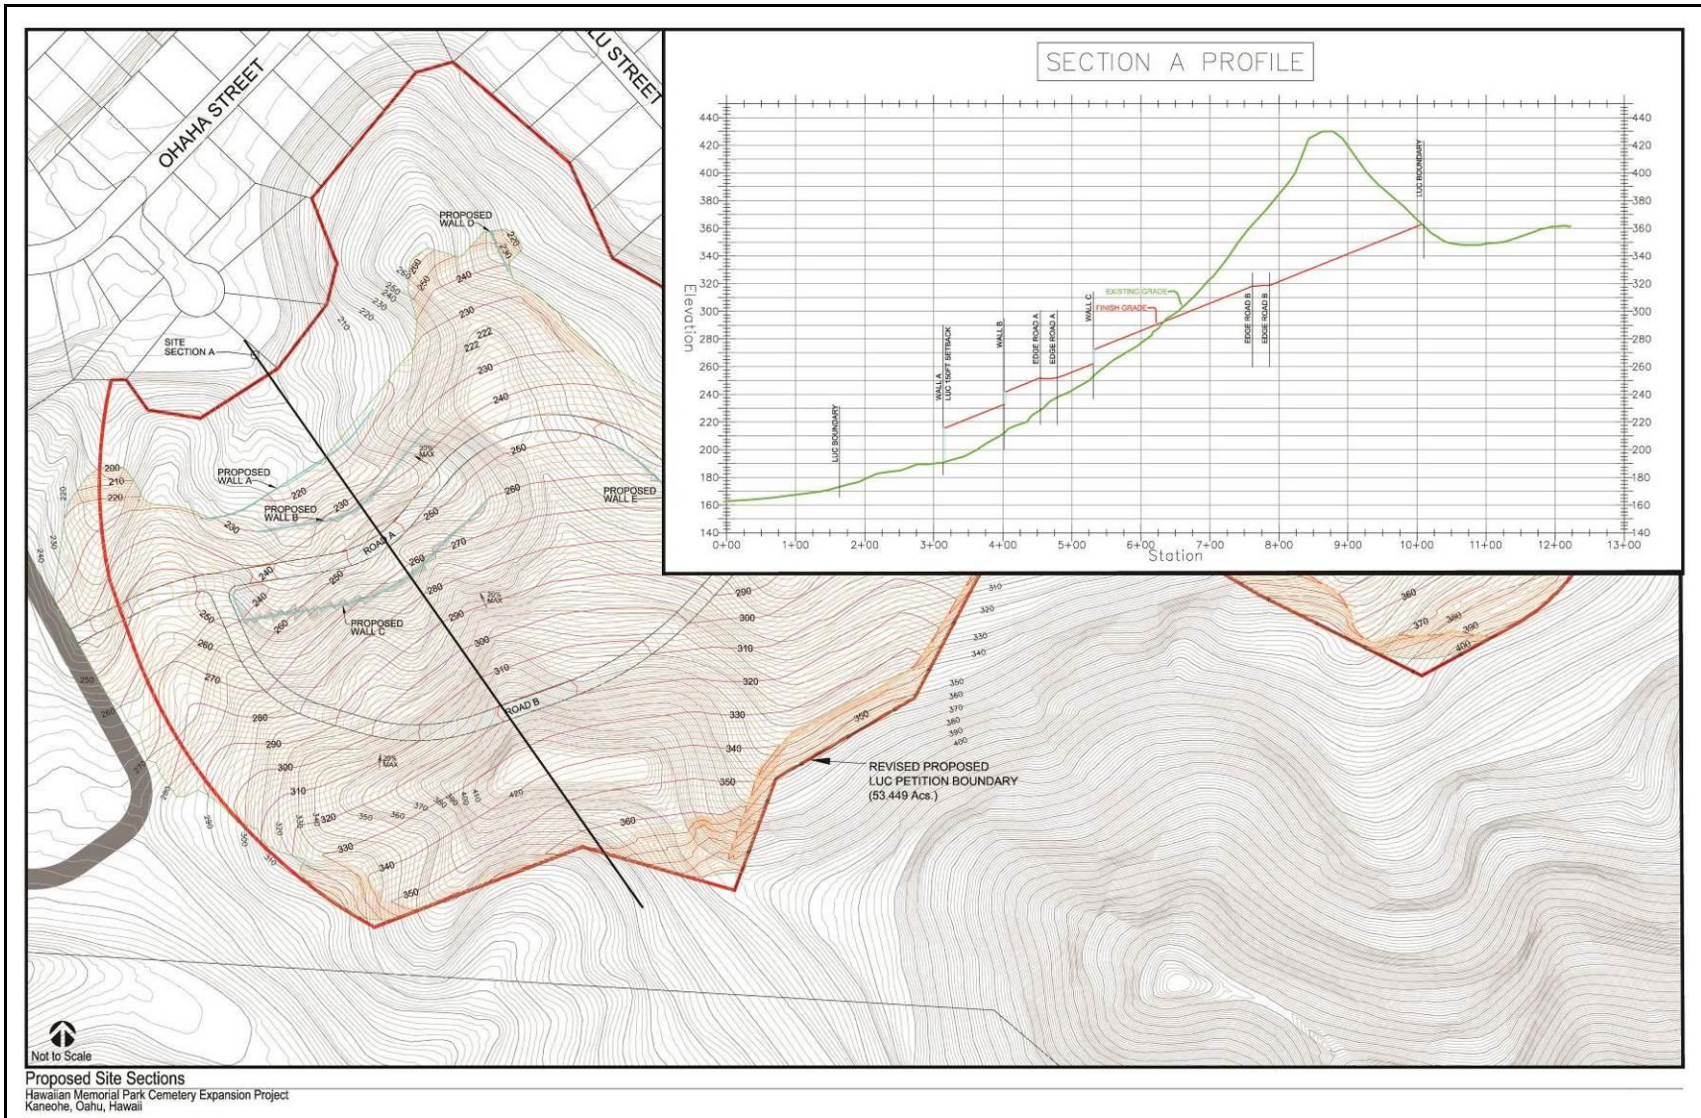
2018 Proposed Grading Plan with cross-section inset (HHF Planners 2018)
